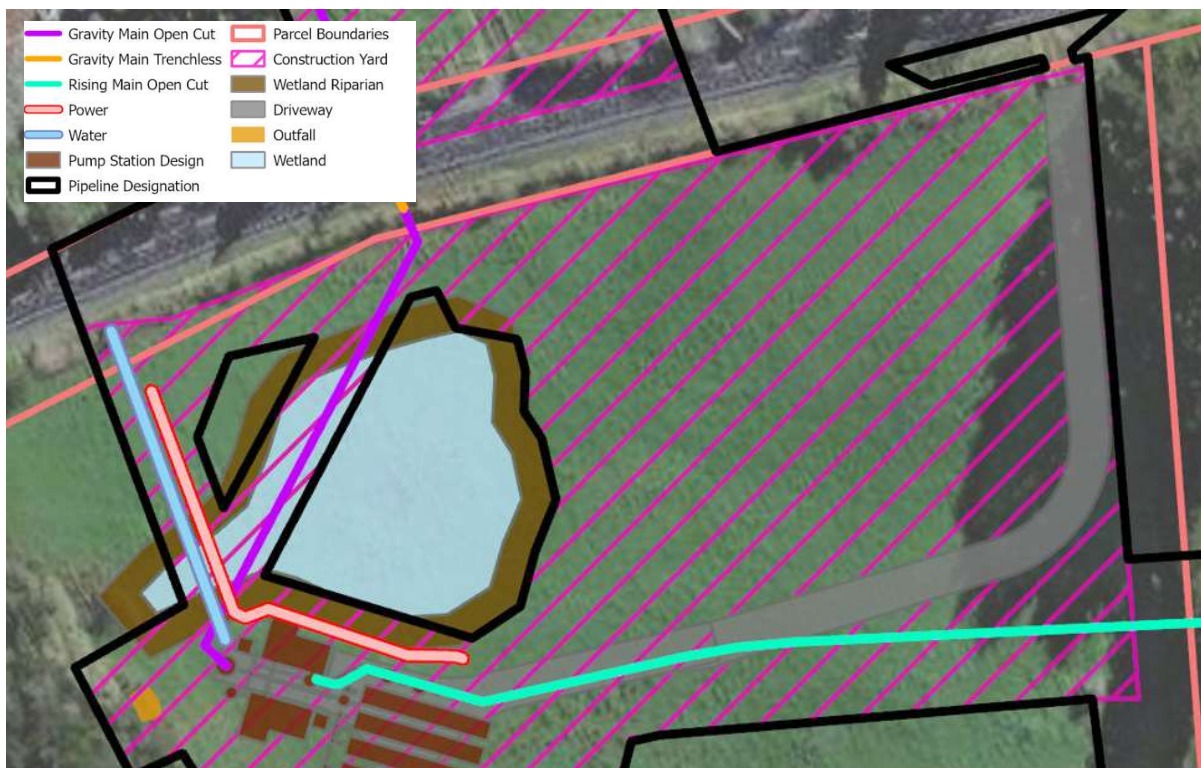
Permanent and temporary access to the pump station (shown in grey)
